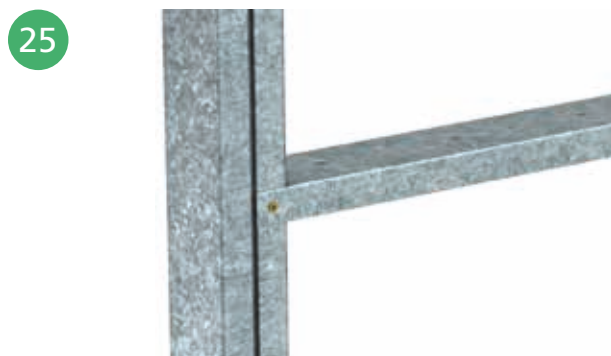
& 25 show installation of Nogging Track when used in conjunction with the MAXIframe® Heavy Duty Framing System.
